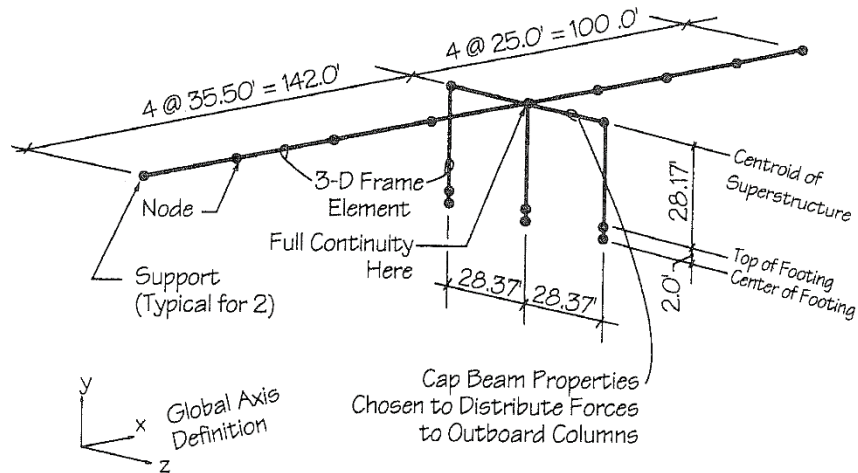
The Two-span Concrete Box Girder Bridge used in the FHWA Design Example 1⁽¹⁴⁾
